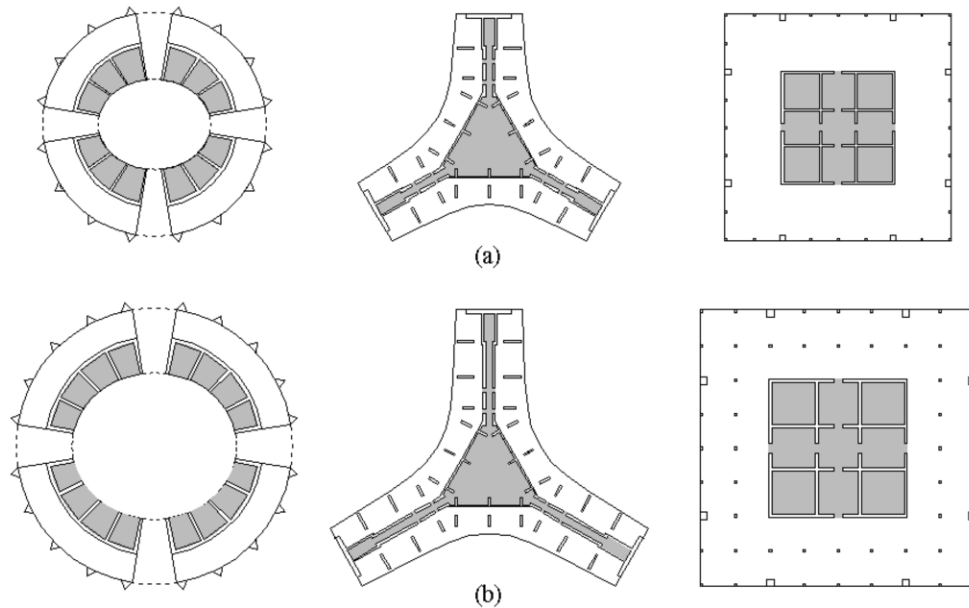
Simplified structural plans for the Nakheel (left) and Jeddah (centre) towers, compared to a standard rectangular plan structure (right). As the structural depth increases, the rectangular building has to sacrifice floor space to accommodate a larger core and lease depth, which the Nakheel and Jeddah towers do not. Figure from Moon (2015).
